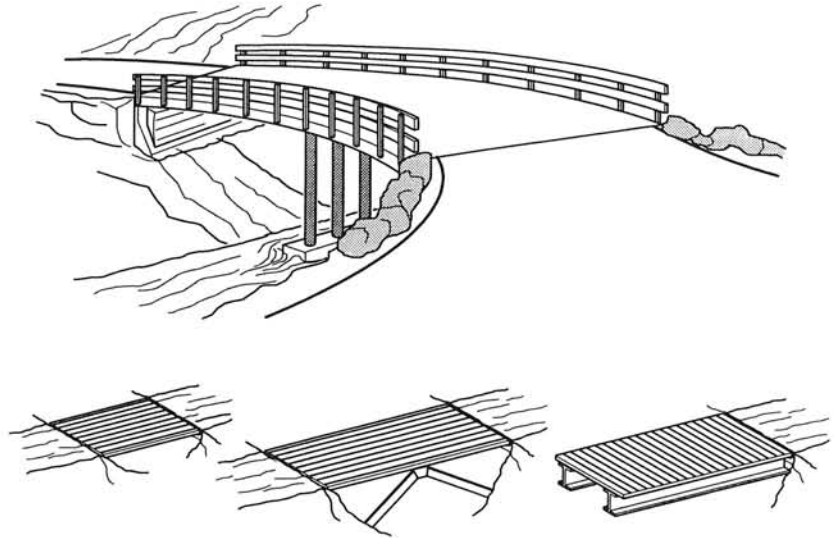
Straight and curved ( $r = 20\text{ m}$ ) prestressed timber decks.
